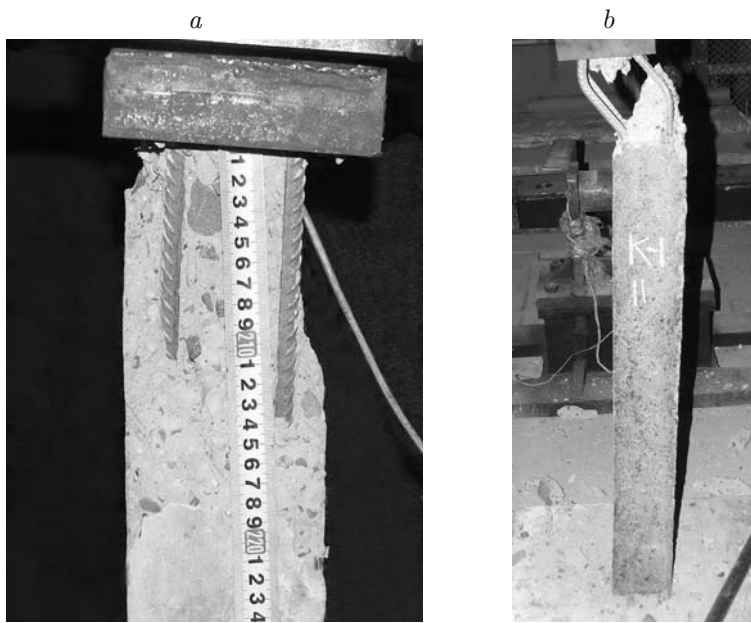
Failure of a reinforced concrete column after the first (a) and second (b) impacts of a 275 kg weight dropped from a height of 70 cm.
